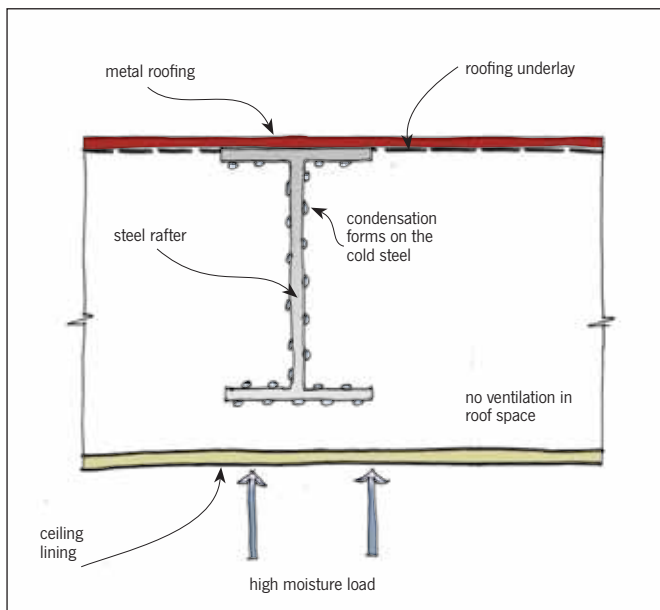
'Aggravated' thermal bridging – the bridging element is in touch with the roof only.
